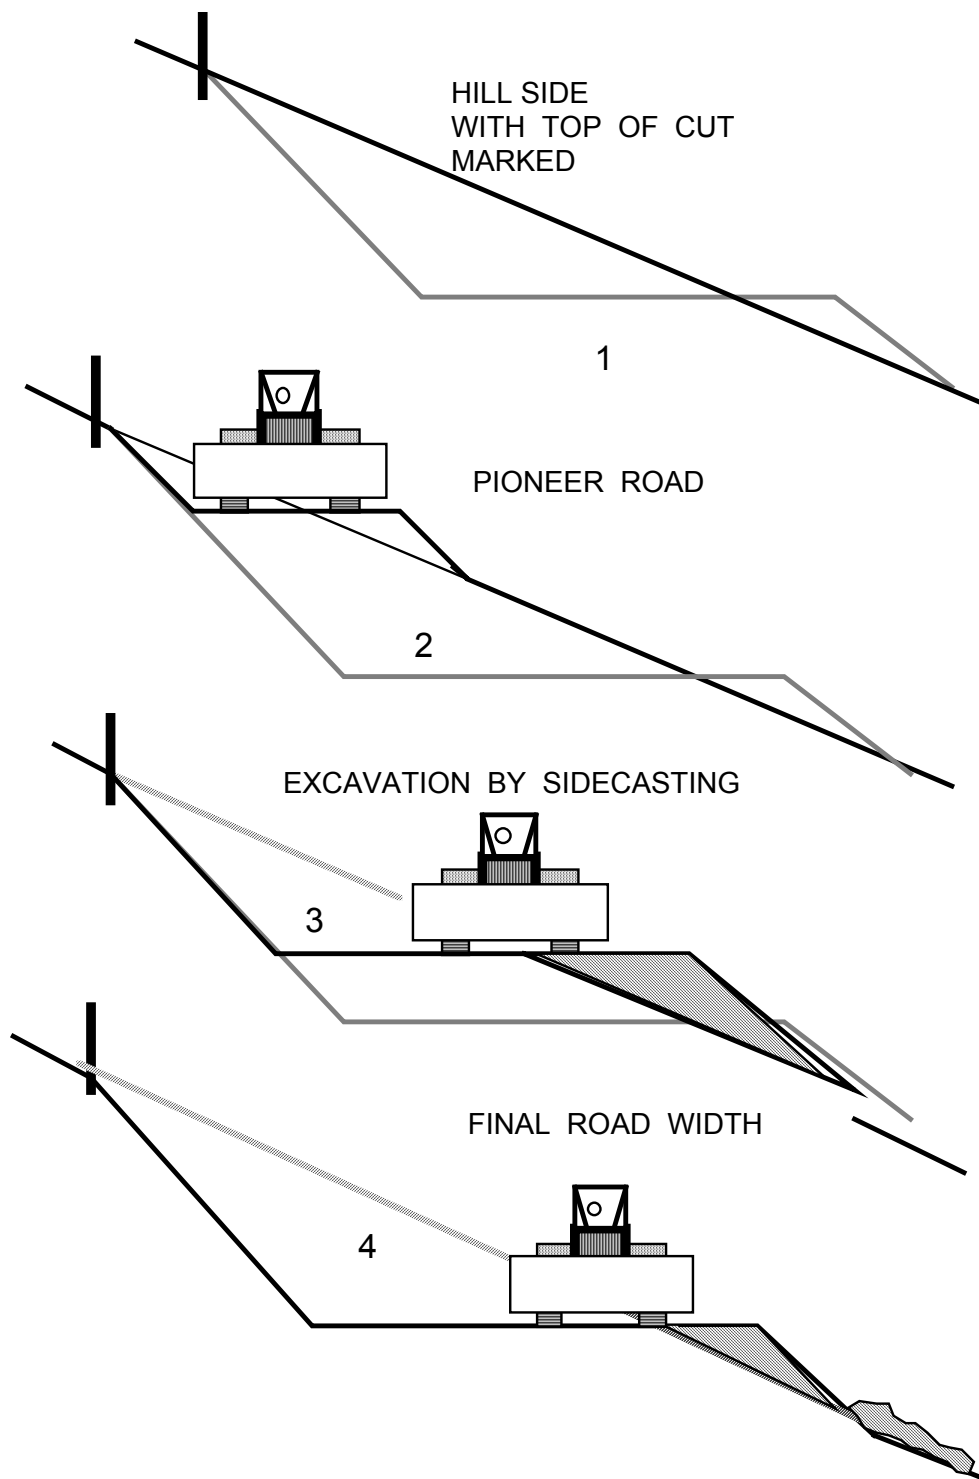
Road construction with a bulldozer; The machine starts at the top and in successive passes excavates down to the required grade. Excavated material is side cast and may form part of the roadway.
